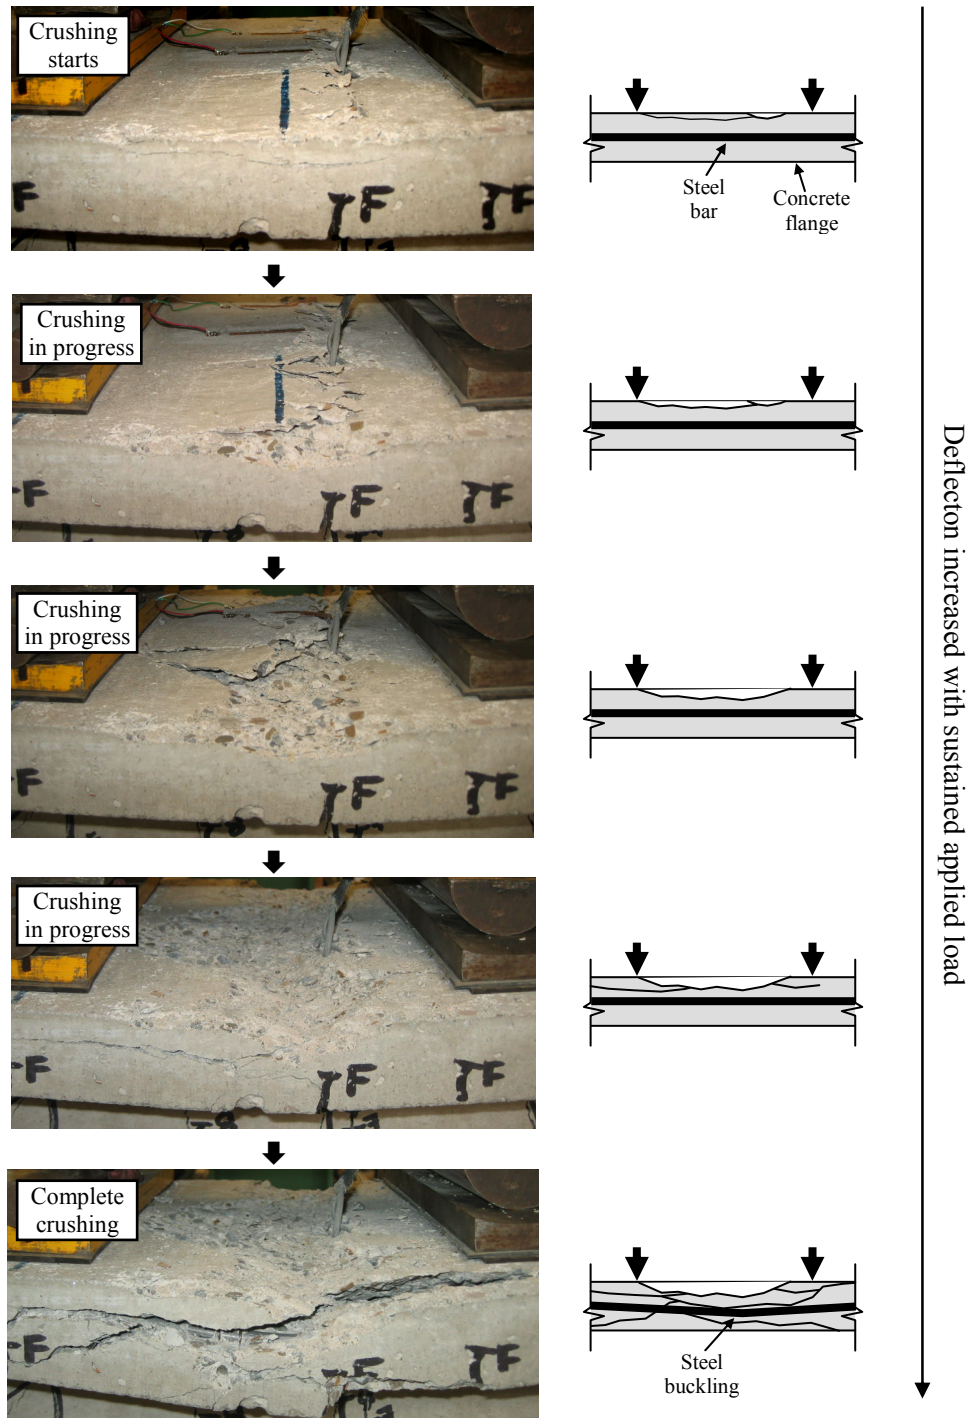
Gradual failure of the RC T-beam at mid-span
